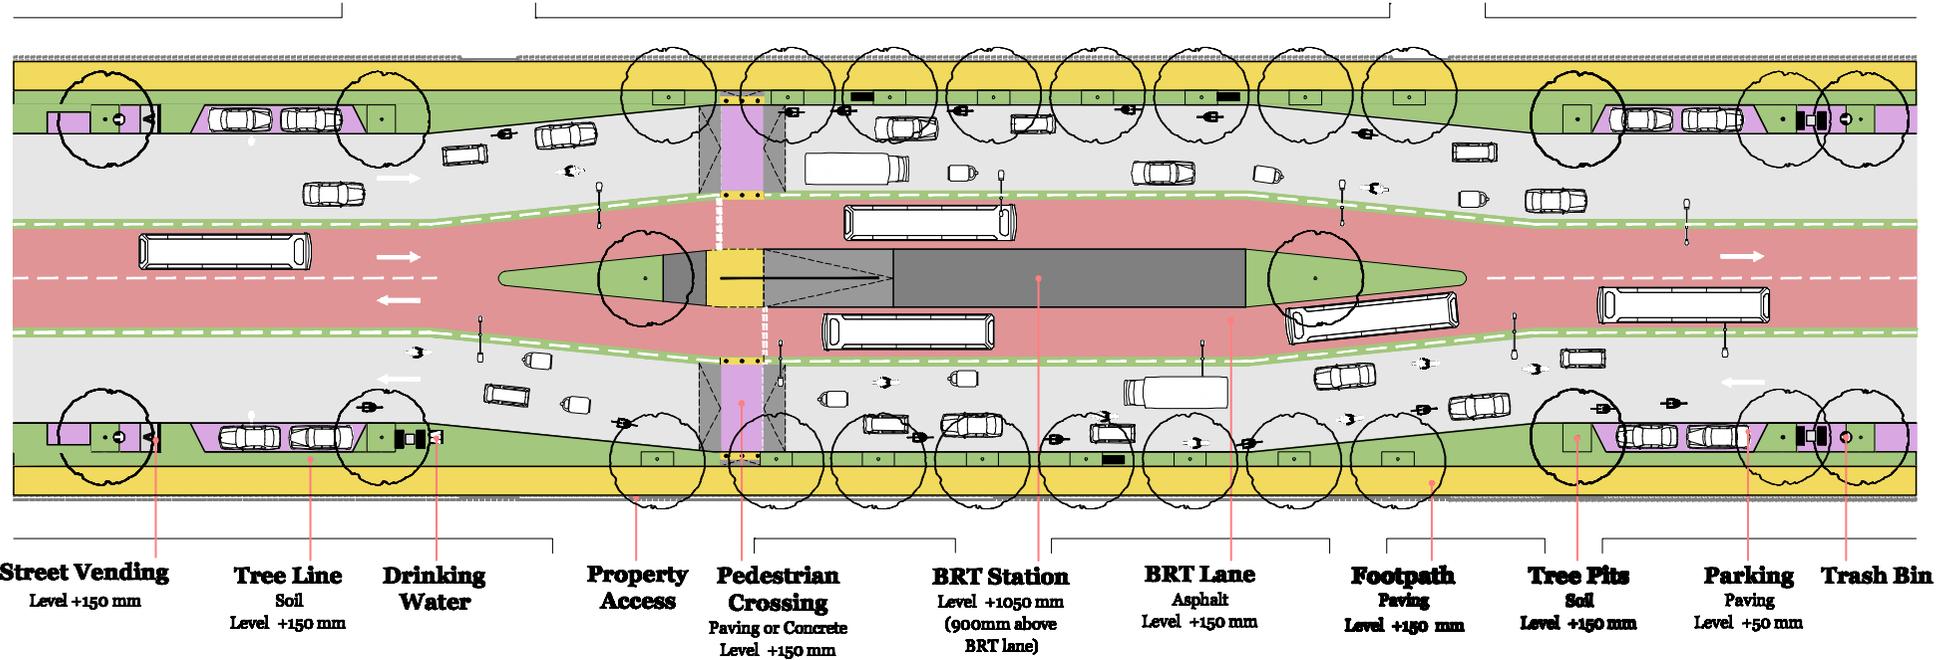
Plan showing typical design for BRT corridors with 30 M ROW
